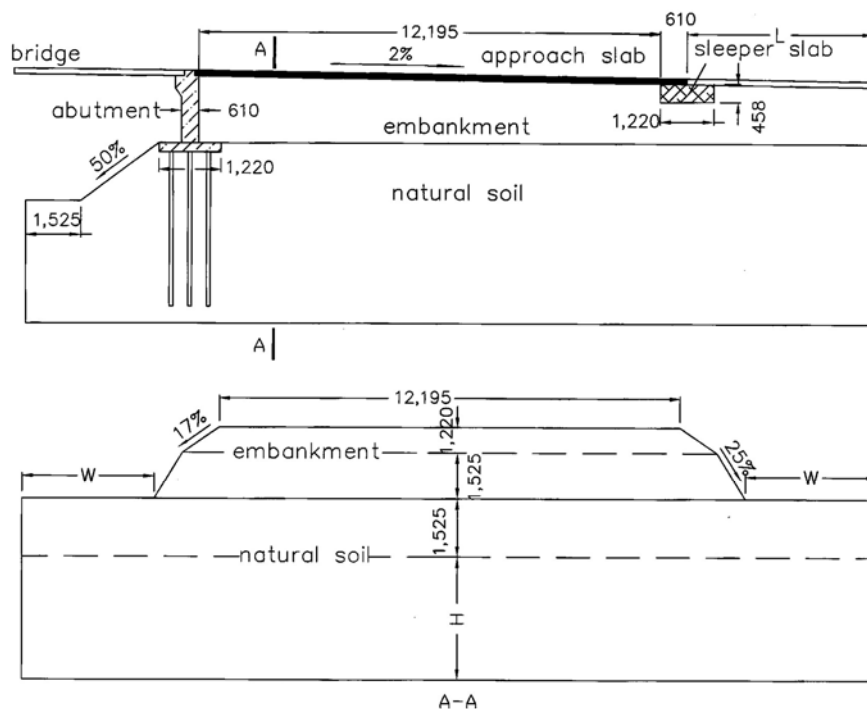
Sketch of bridge abutment (unit: mm)
